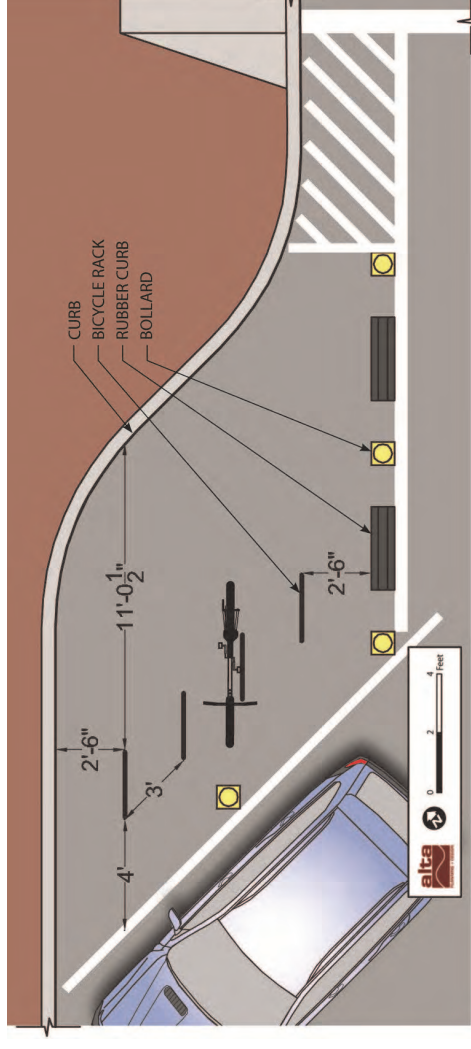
3rd Avenue and B Street Bicycle Parking Plan View
